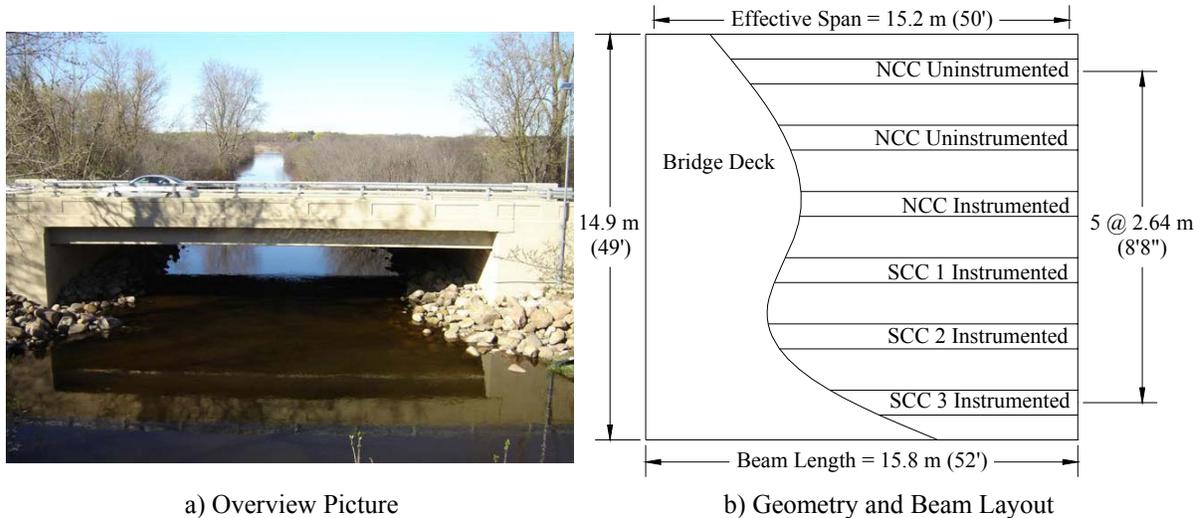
Picture and Plan View with Beam Layout of M-50/US-127 Bridge
